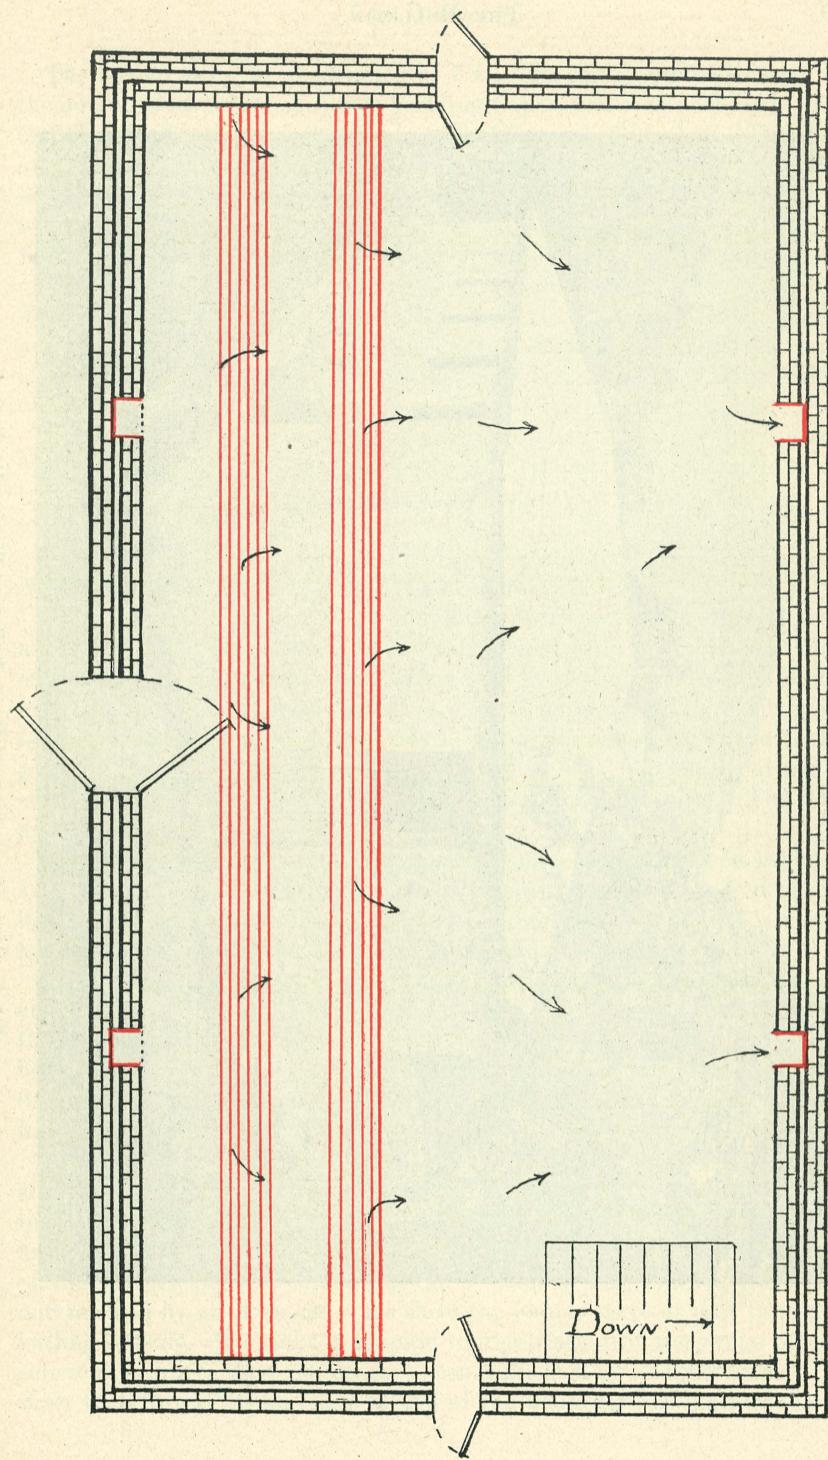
Upper story of Mr. J. R. Sams' apple storage house, showing ventilation through slatted portion of floor.
